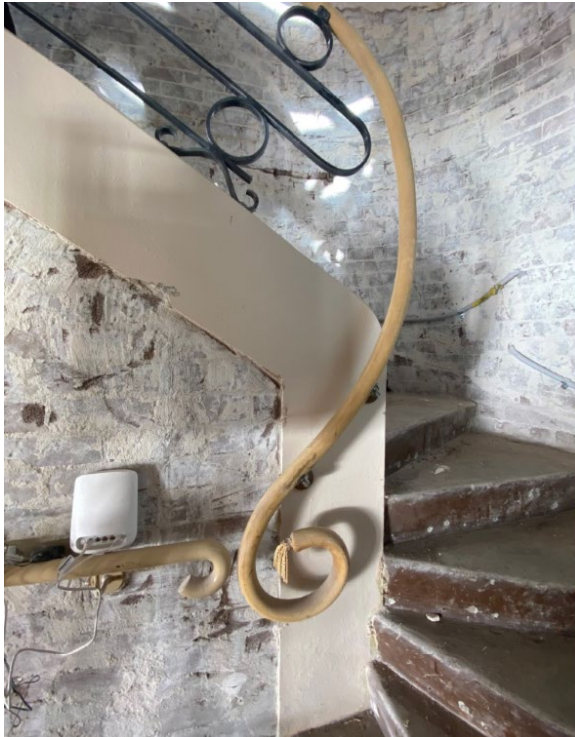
Brick stairwell and concrete stairs with steel handrail, curved motif, velvet covering and tassel. (Source: GML, July 2024)
